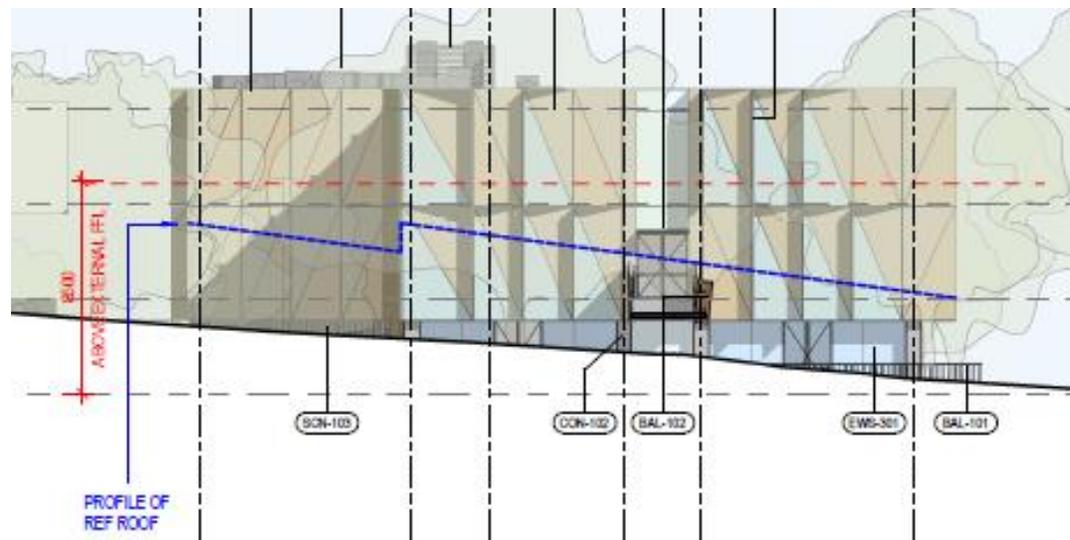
North elevation showing 8.5m building height (dotted red line) (source: Architectus).
